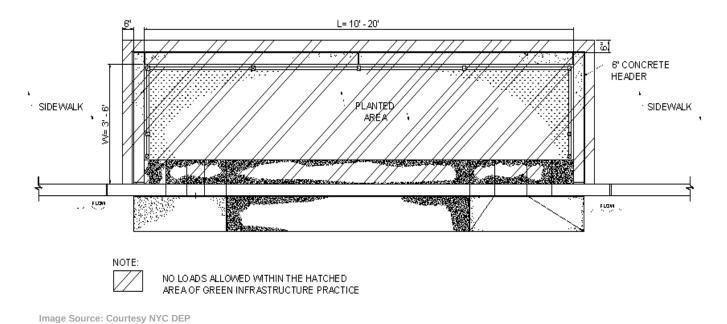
Schematic Example of Prohibited Loading Areas Around a Rain Garden
